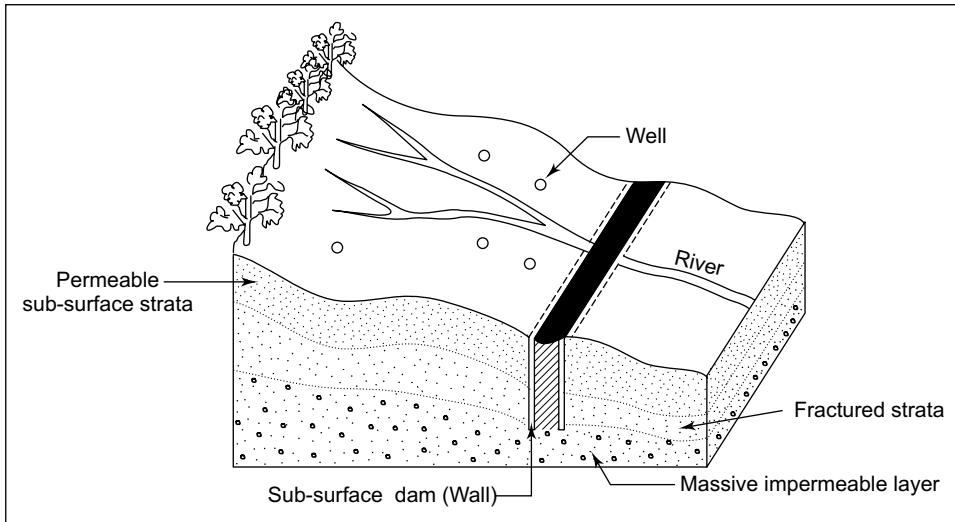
Schematic view (in section) of a sub-surface dam
